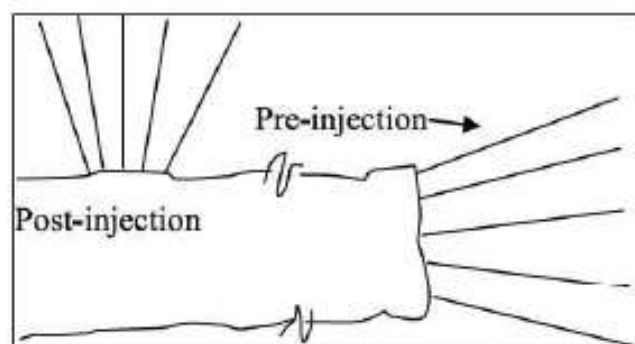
Pre-excitation grouting and post-grouting in schematic tunnel plan view
